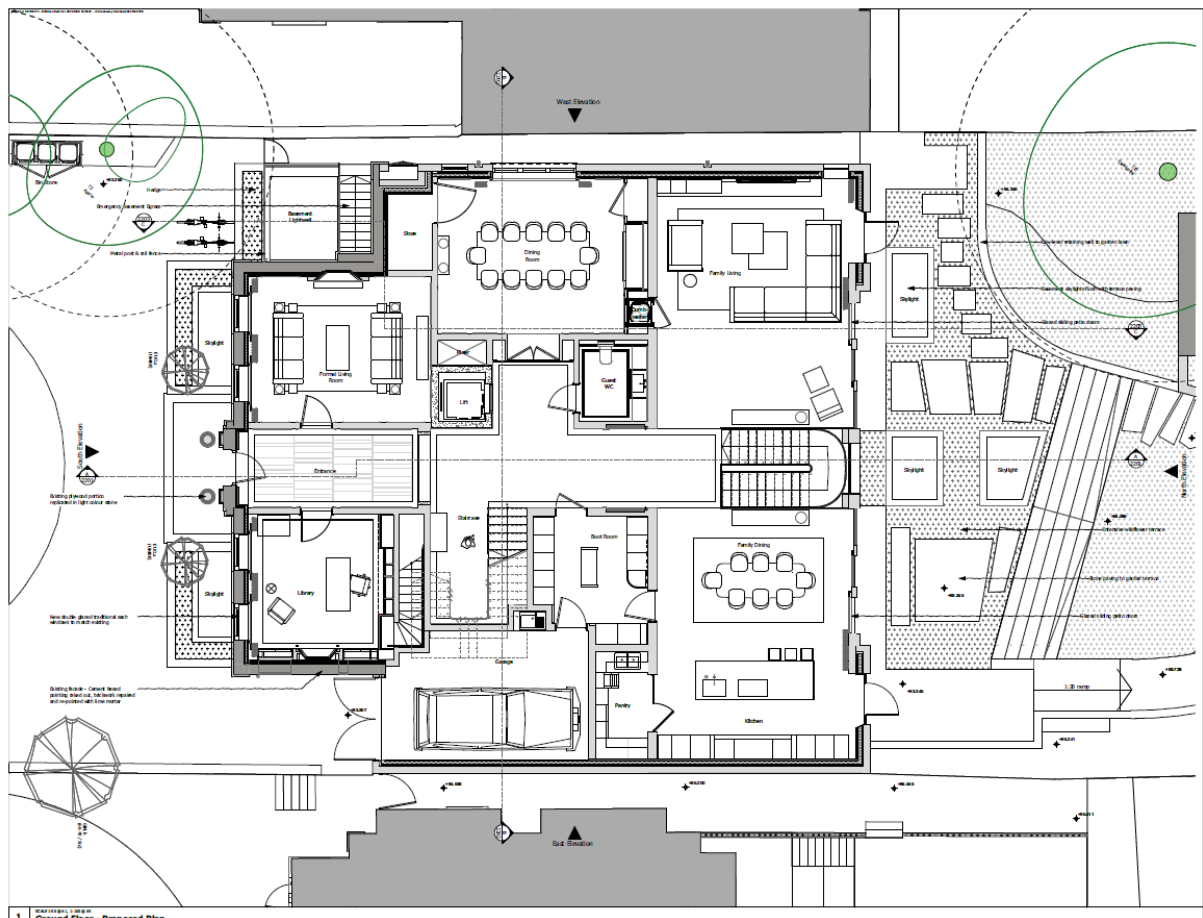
Proposed Site Layout (SHH Architecture, May 2022)
